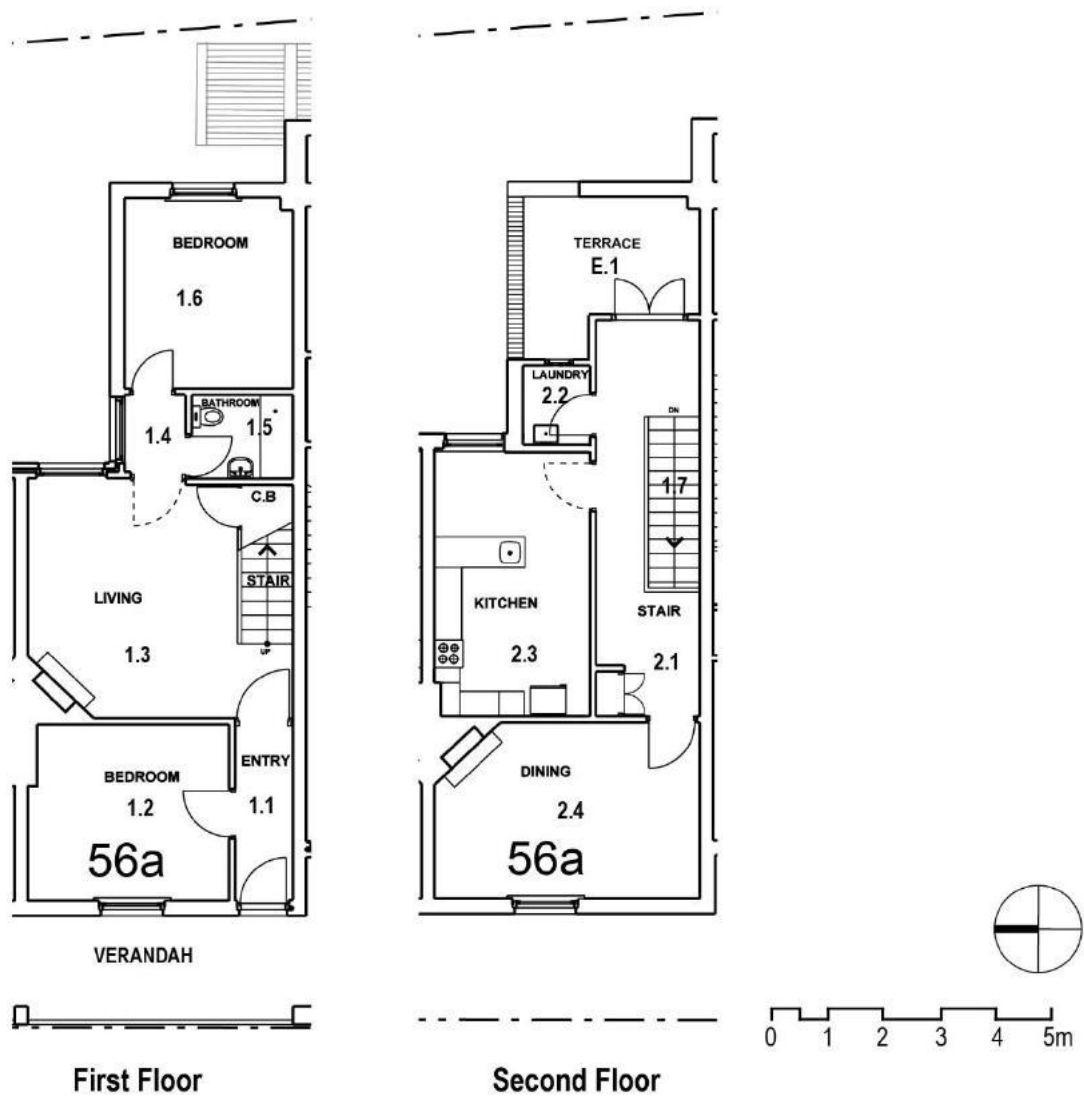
Floor Plans of Flat 56A / 46–56 Gloucester Street showing layout of flat and space numbers, for the first and second floors. (Source: LAHC, with GML overlay 2016)
